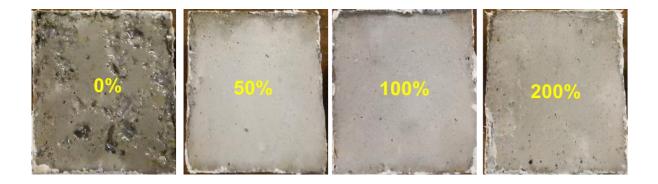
Concrete surface morphology after freeze-thaw damage
